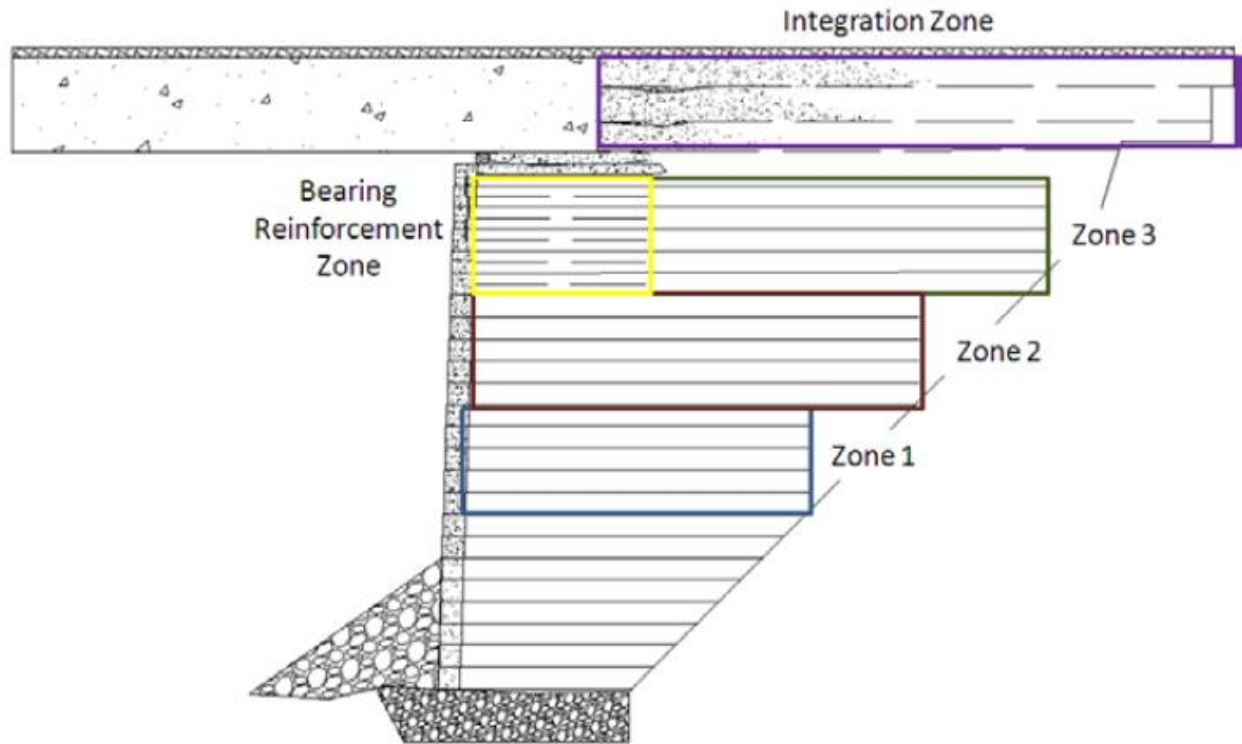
Reinforcement truncated in zones for a GRS abutment (Adams et al. 2011a).
